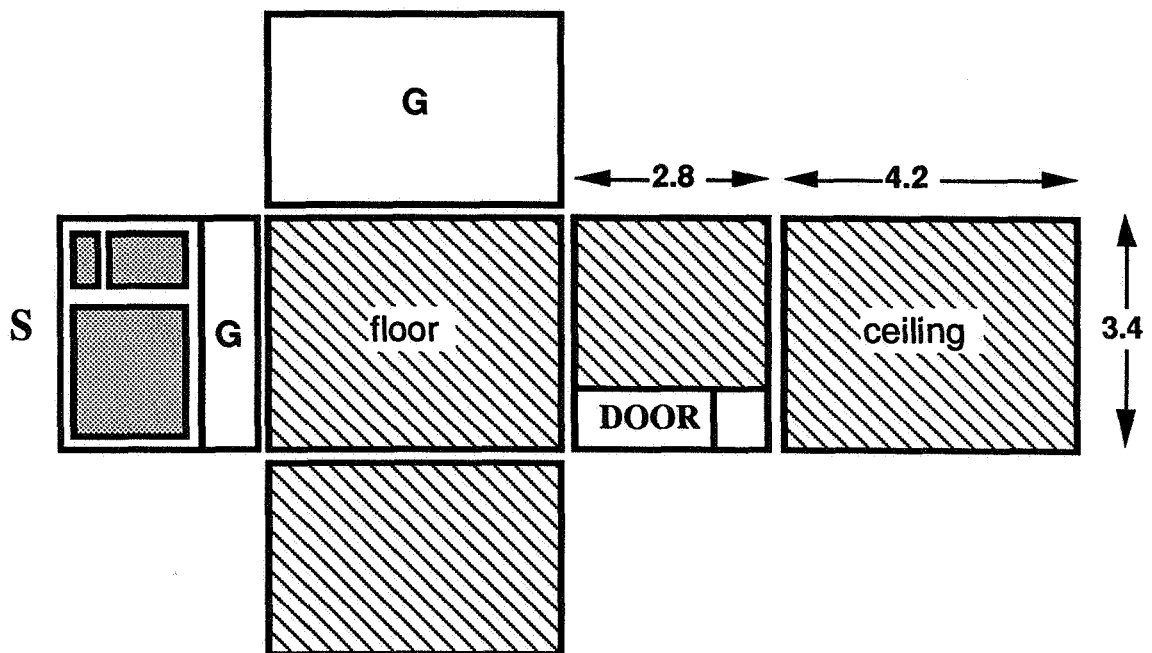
Floorplan of the LESO test room. The walls, floor and ceiling have 10cm glasswool insulation as a second layer. The first layer is 10cm concrete (dashed) and 1cm gypsum (G). The door is of wood. The windows have an U-value of $1.5\text{W}/\text{m}^2\text{-K}$. The maximum window opening is 0.85 by 1.05m^2 and the distance between the top of the opening and the ceiling is 0.7m . The width of the window could be reduced to 27cm by placing a wood board in the opening.
